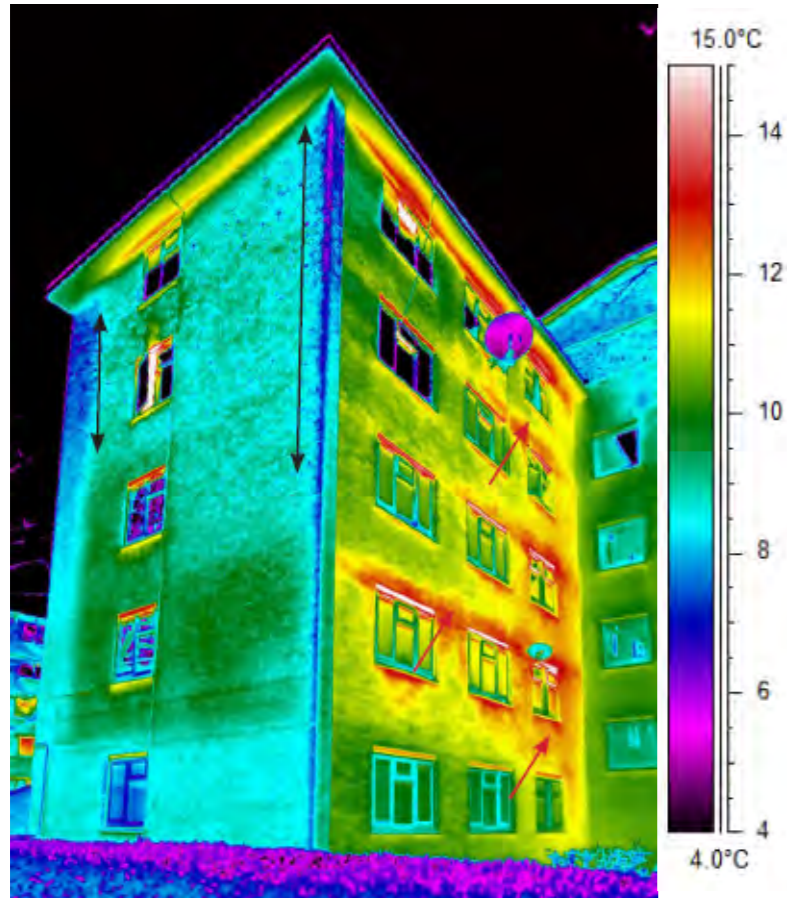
Wall to the south of the staircore. Red areas above windows show heat is being lost here, presumably through metal lintels that bridge the wall. Larger patches of red above and below windows suggest that the wall is wet here. Cavity insulation may be damp. Drip marks below some of these windows suggest that there may be a problem with drainage from above here. The contractor will need to carry out further investigations to establish the cause of this water marking, and allow to make it good.
